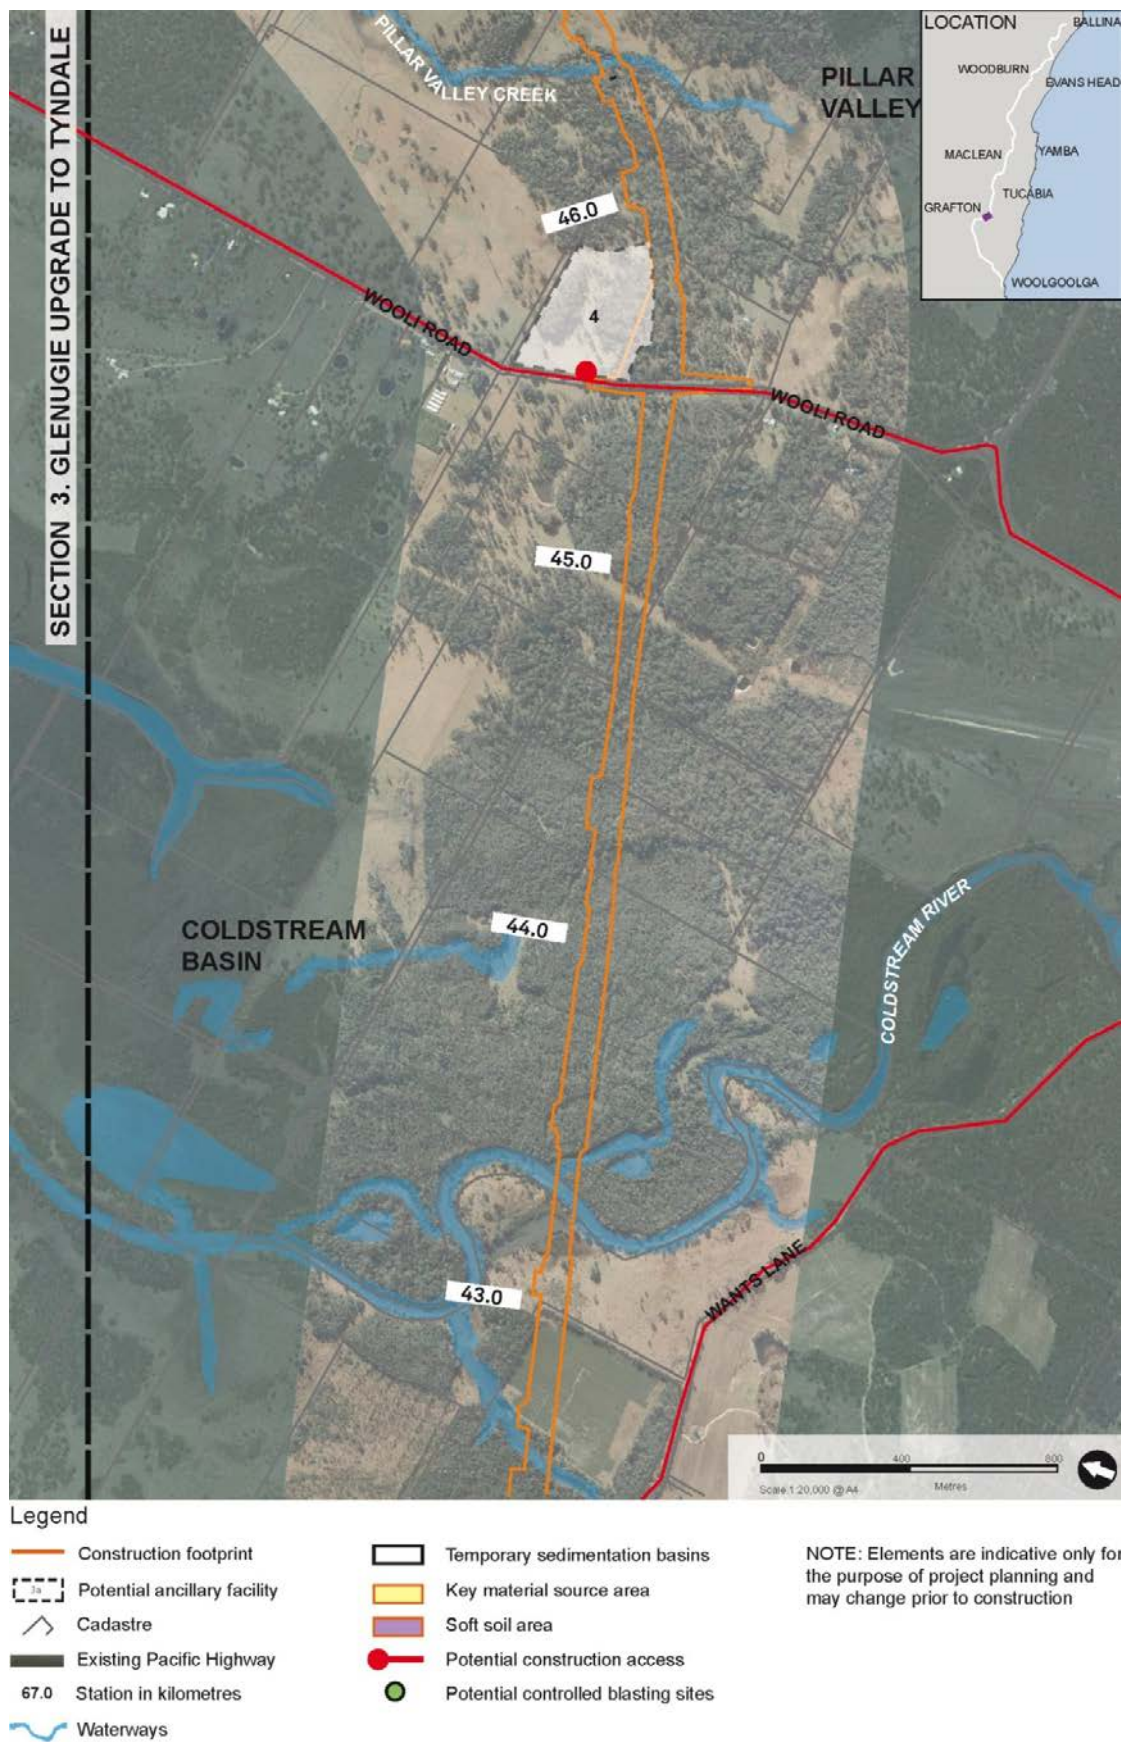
Extent of construction and construction features Section 3 (Station 42.6 to 46.6)
